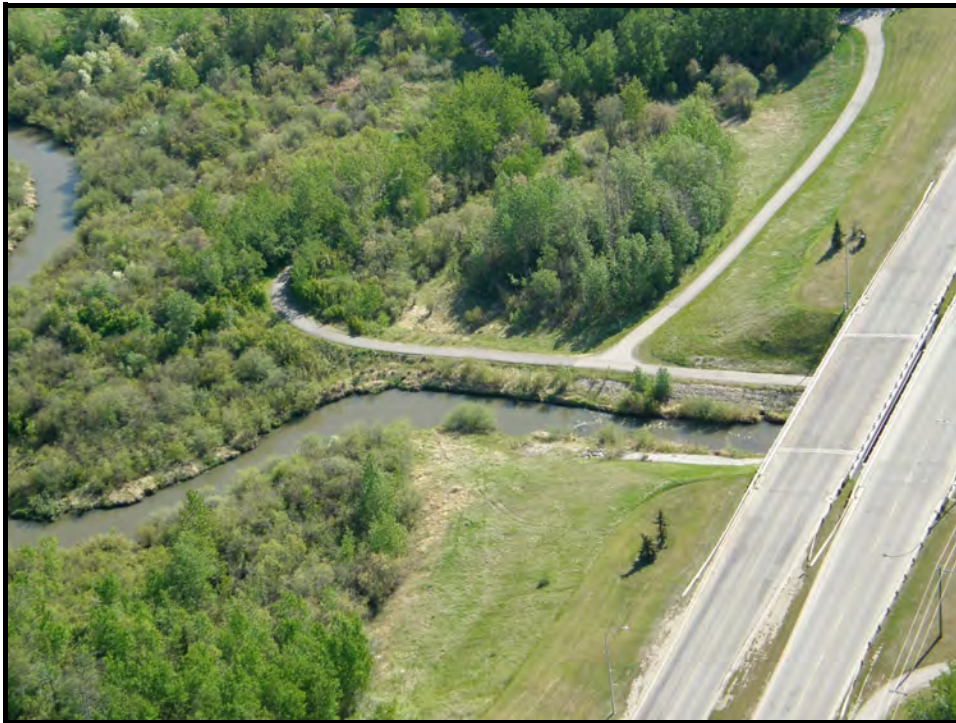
Looking west at Bear Creek, with typical parkland trails. A drainage channel extends from the west to flow into Bear Creek. Located north of 79 Avenue and east of 102 Street.
